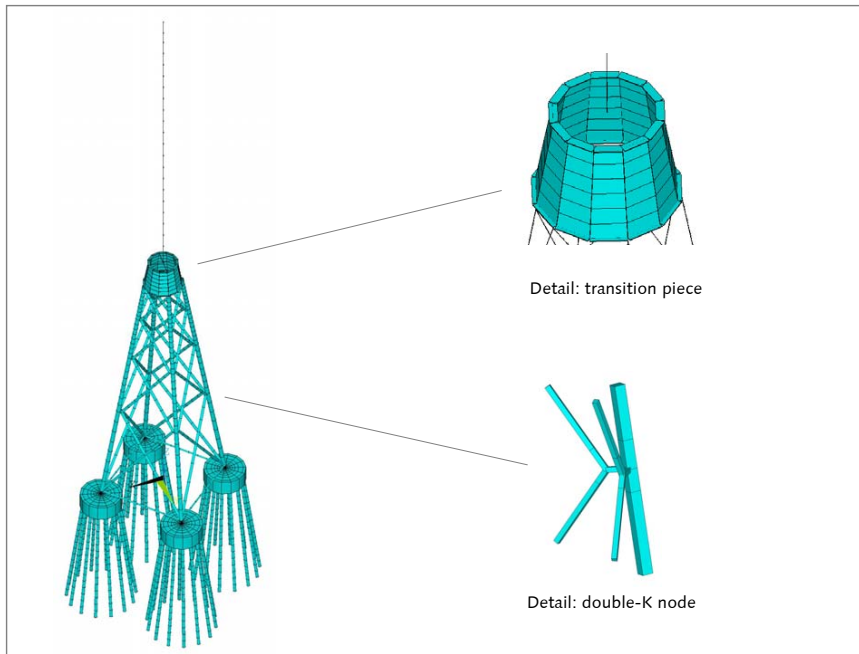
FE model – onshore foundation, lattice structure, transition piece, and tubular tower
